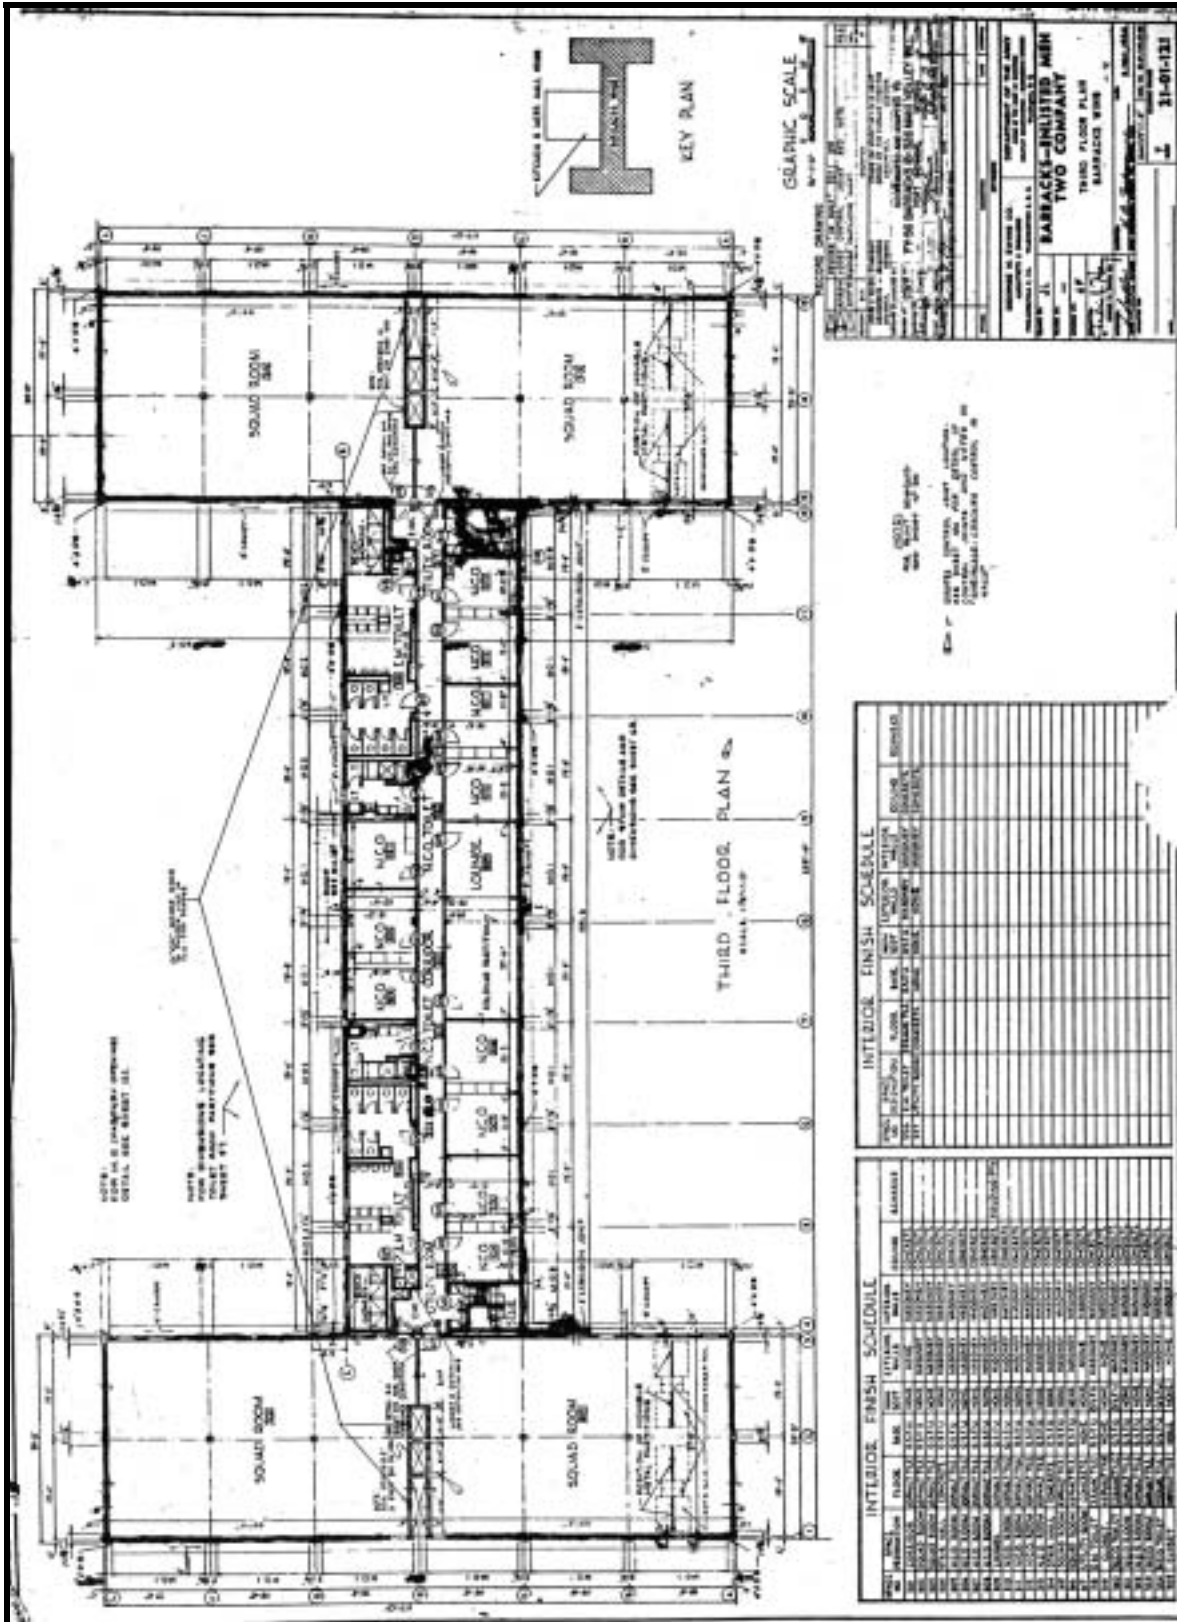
H-style, two-company barracks, barracks wing, third floor plan (ca. 1955, revised 1958) (Engineering, Ft. Benning).
